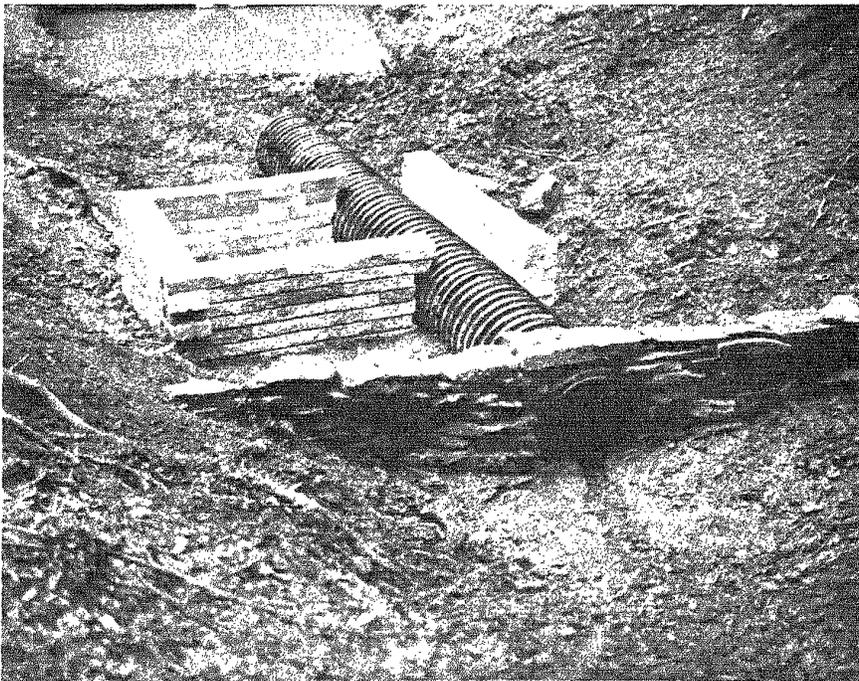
Fill material is placed around the blocks and the culvert is laid on the enclosure. The culvert is positioned so that it is centered lengthwise on the upstream block wall and there is enough space to construct a block wall behind it. To avoid changes in stream chemistry, the headwall at the inlet end of the culvert (foreground) is constructed of native stone removed during excavation.
